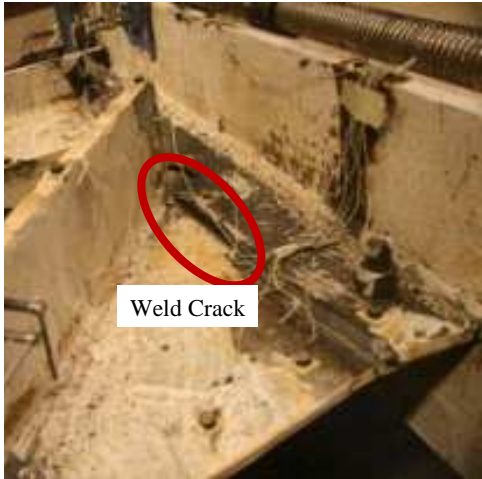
W3 in North Gusset-to-Shear Tab Weld
